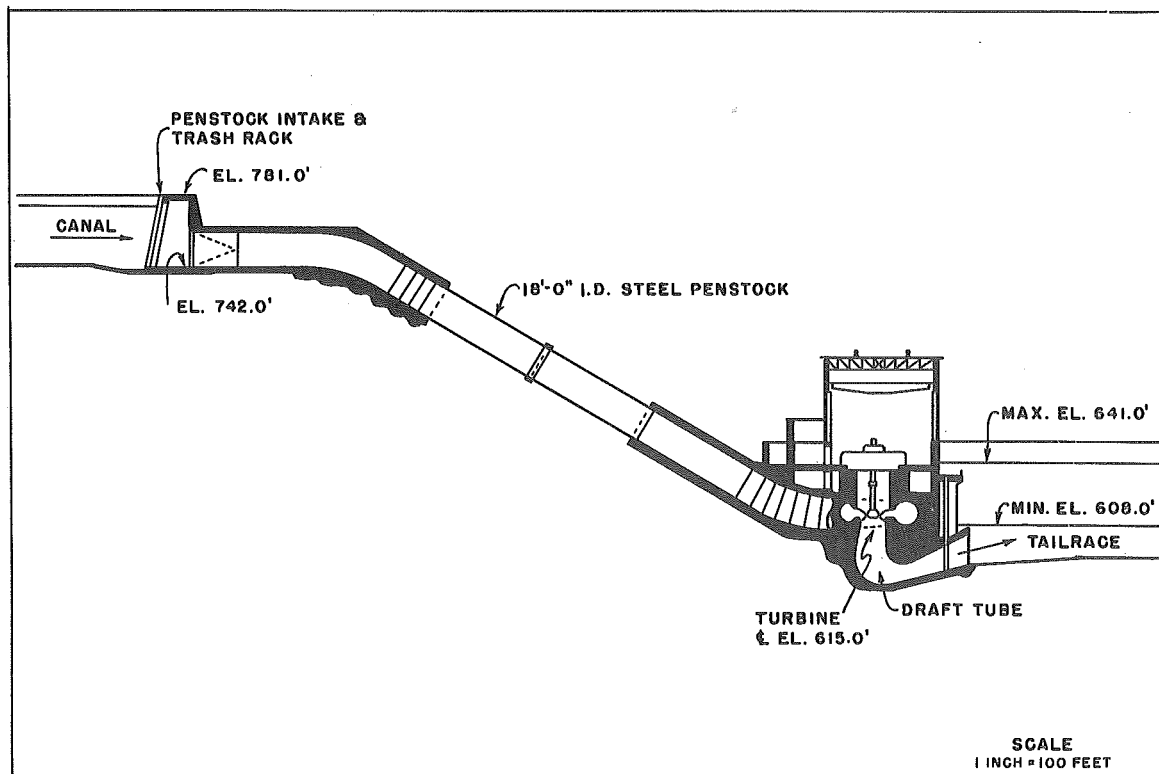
Longitudinal section through the penstock intake, penstock, turbine and tailrace.
